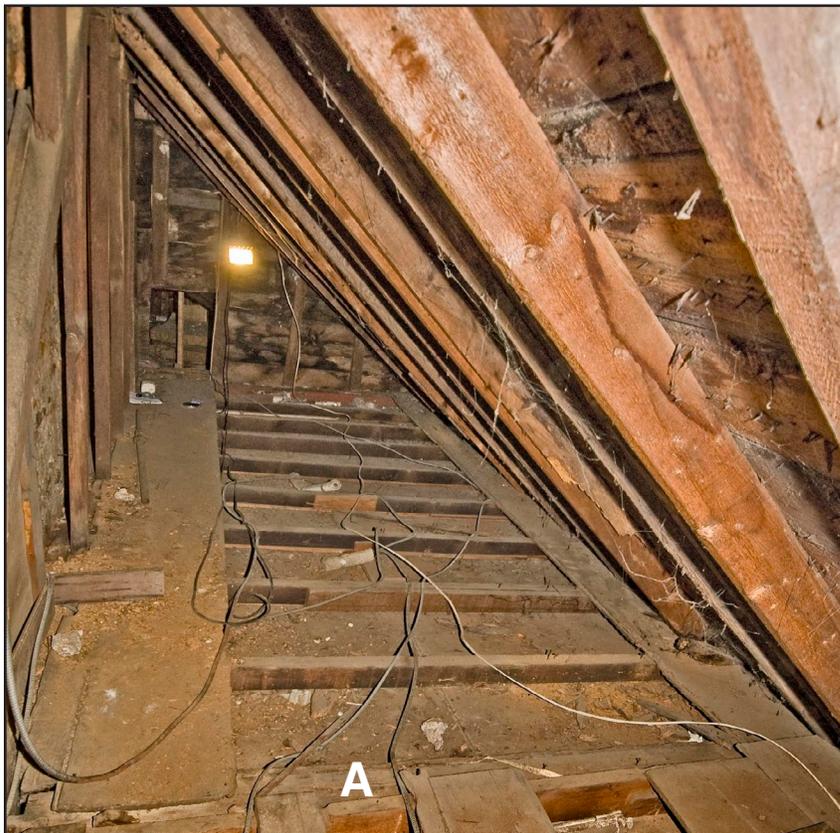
Leanto attic behind parlor chamber looking towards west wall. The remaining floorboards are nailed with 18th century wrought nails and are original along with the floor joists. The beam marked "A" is the leanto chimney girting. The current ceiling in the leanto kitchen is nailed directly to the underside of the floor joists. There was once a small door from the chamber into the leanto attic that would have facilitated its use for storage.
